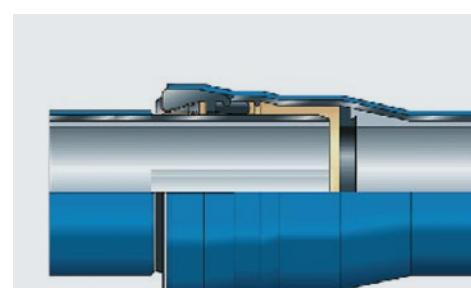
Double chamber socket (DKM®) spigot-and-socket joint
